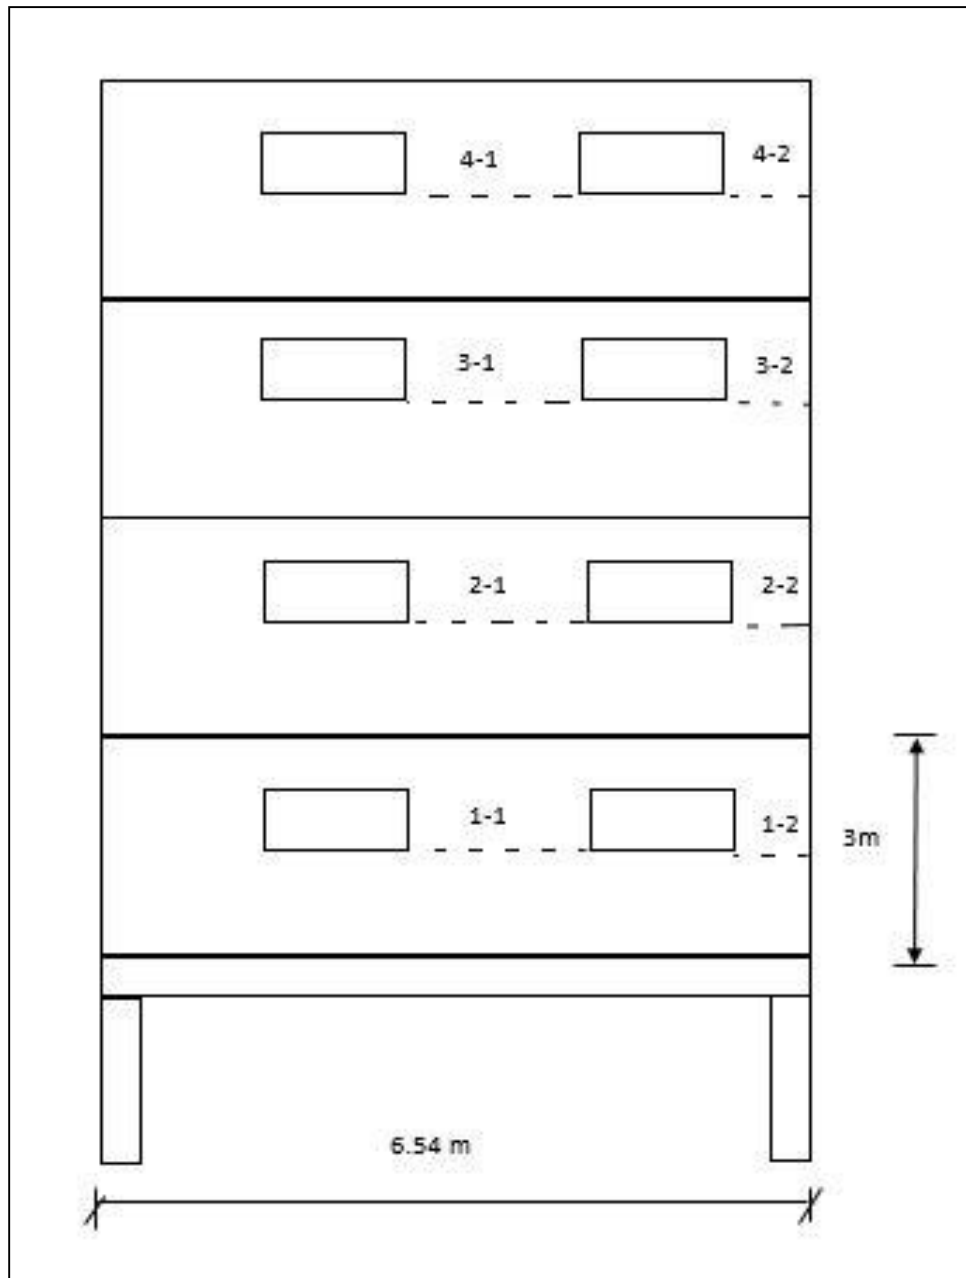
Schematic diagram showing the critical section cuts of wall C-C marked in the plan view of the building
